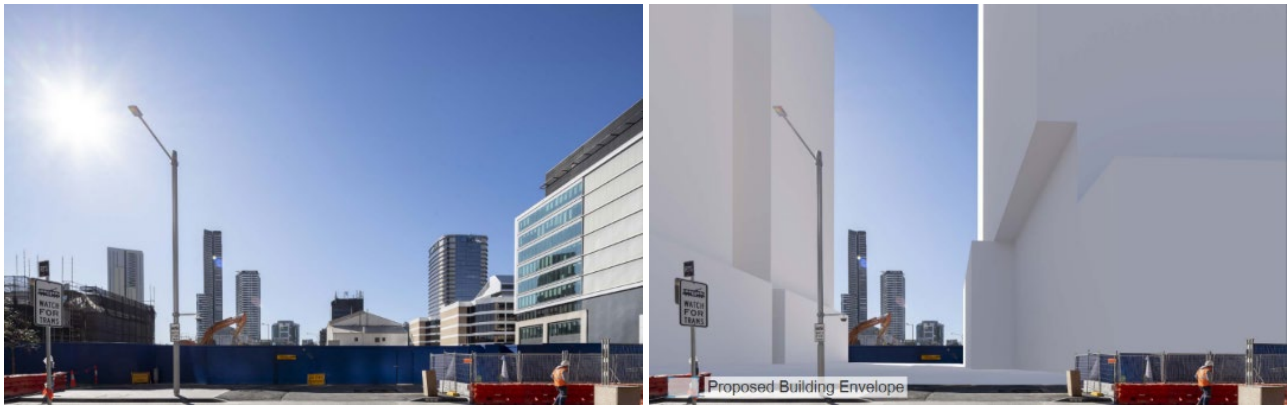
Viewpoint 02: Existing (left) and with proposed building envelope (right)
